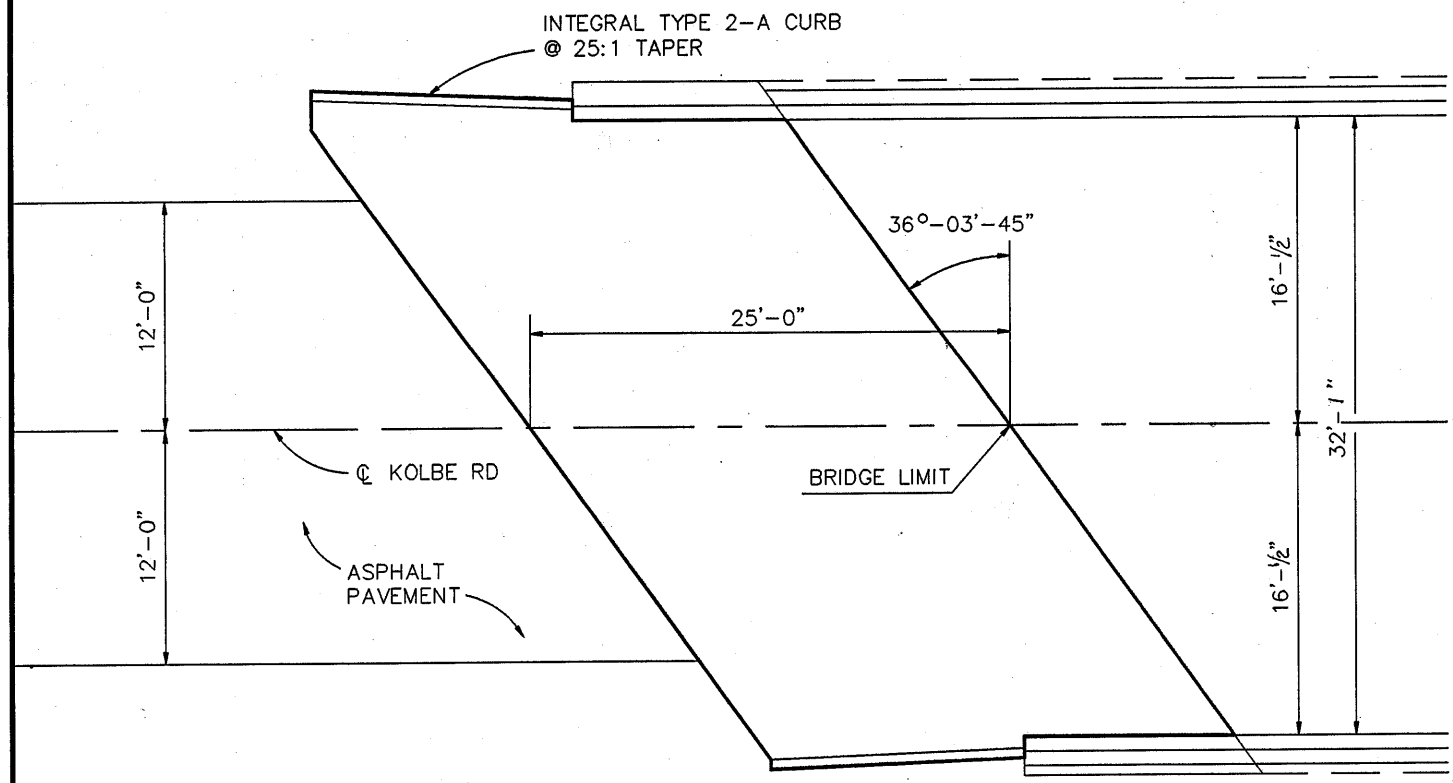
DETAIL FOR TRANSITIONING RESURFACING TO NEW APPROACH SLAB
